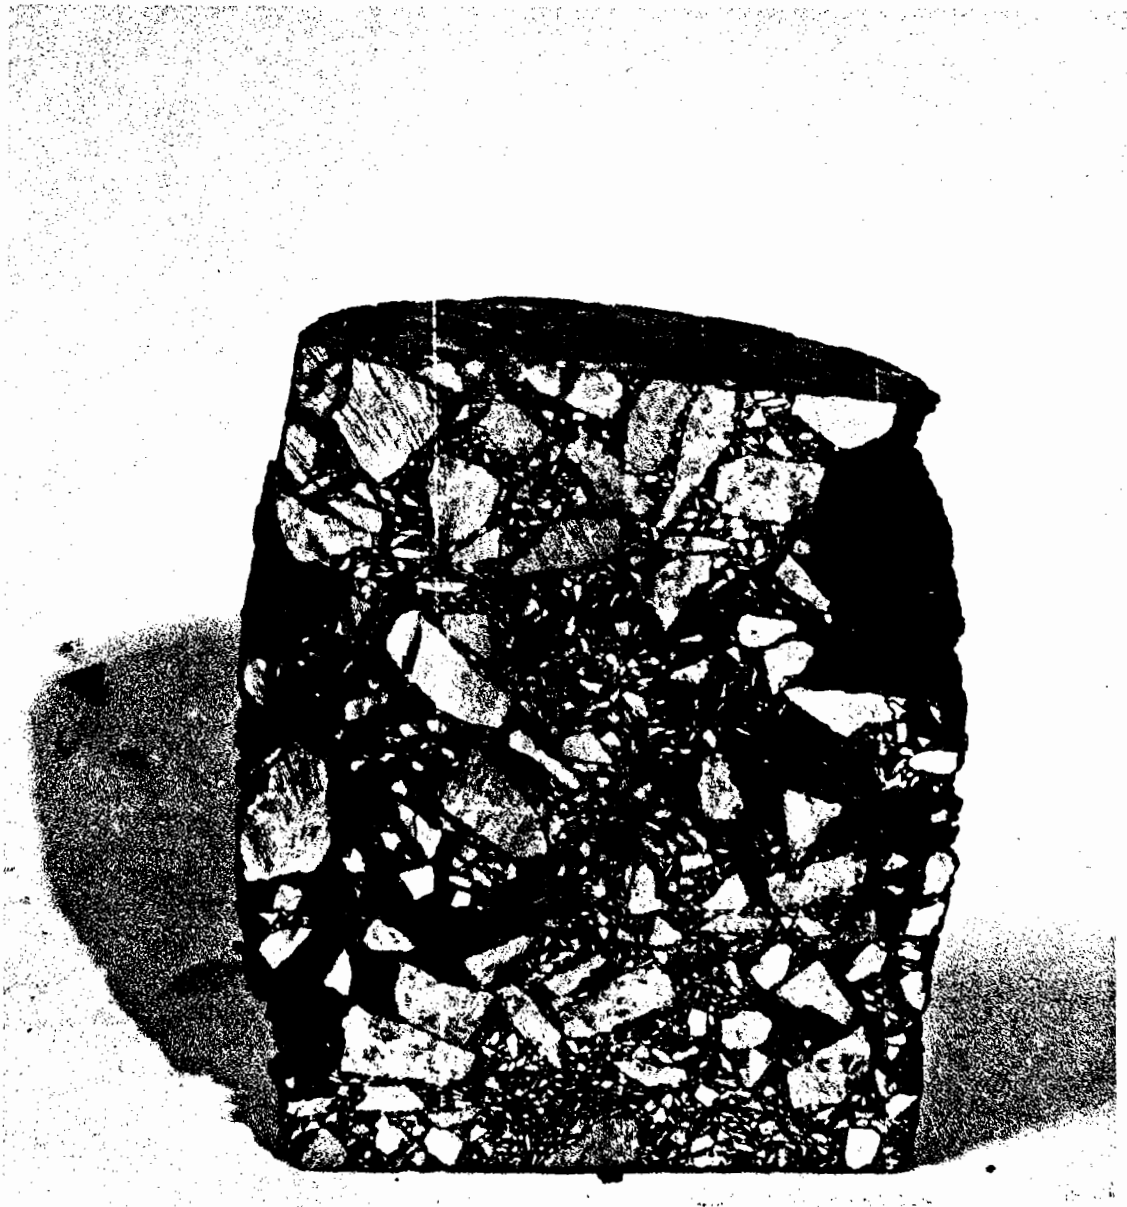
Sectioned 100 mm (4 inch) diameter specimen
